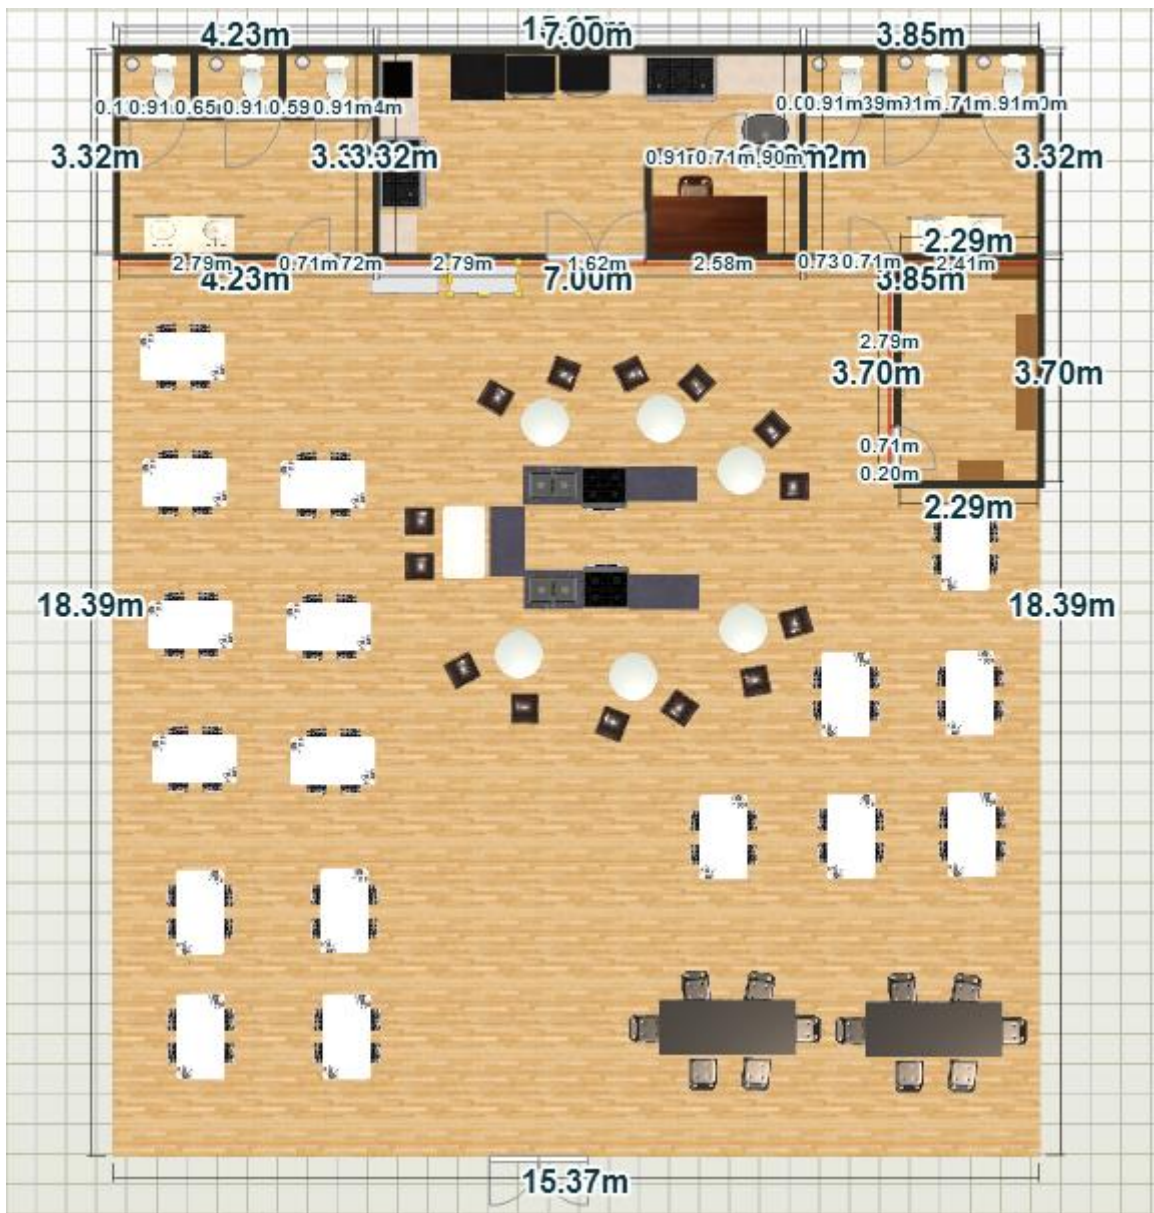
A Detailed Floor Plan of Pelmeni Bar with Space Measurements
